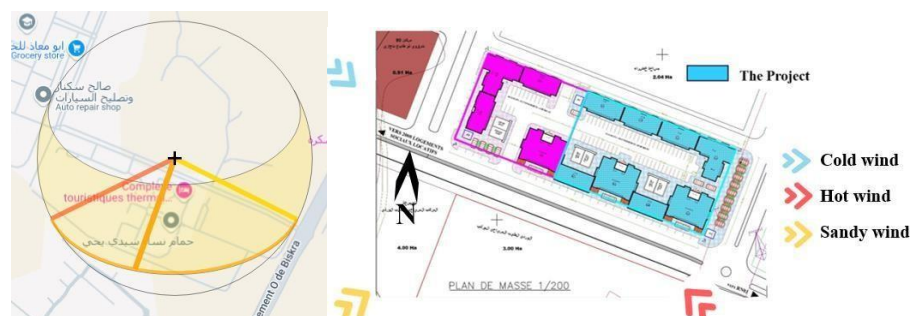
Sun and wind path of the site. (Source: design office Nebar Omar +Author treatment , 2025).
